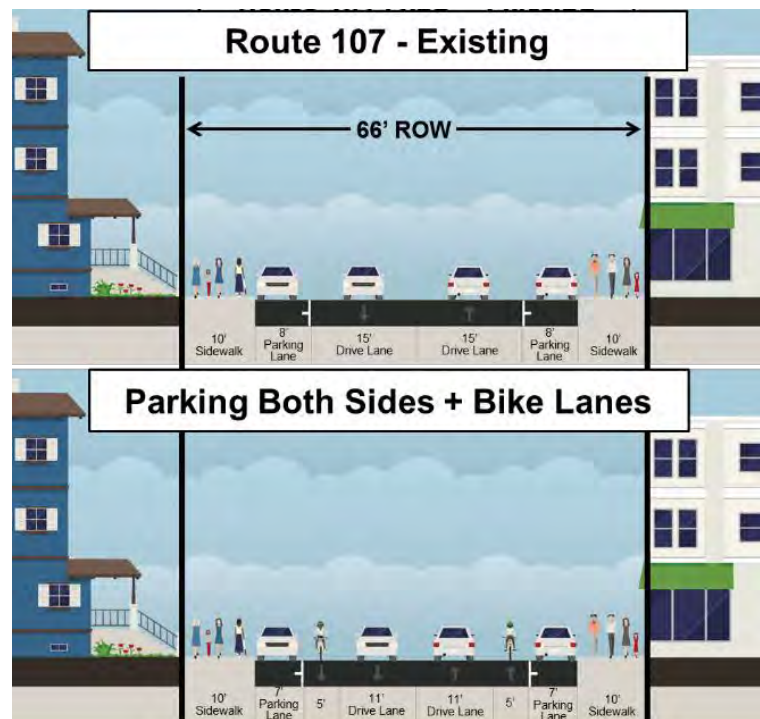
Potential Cross-Section – Parking Both Sides + Bike Lanes
